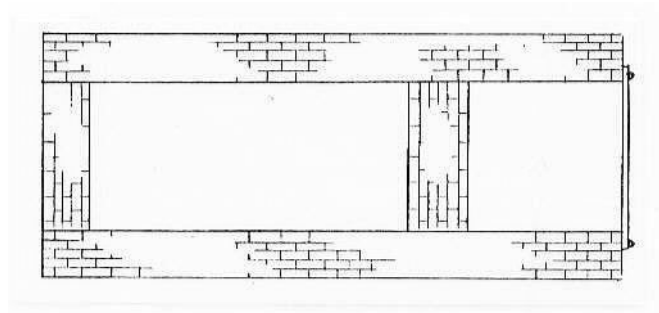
Few return-tube boilers currently remain intact and have been reduced to setting remnants and foundations. The plan view depicts the footprint of a setting remnant. Source: Twitty, 2002:145.
